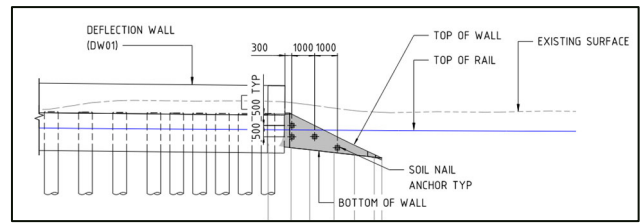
Soil nail wall - deflection wall transition alignment at the Billy Hughes site
